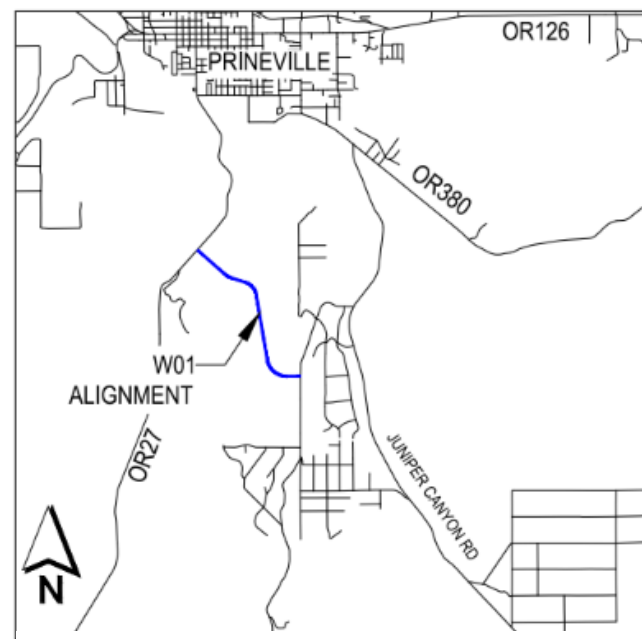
Recommended Juniper Canyon Access Alternative – W01A
